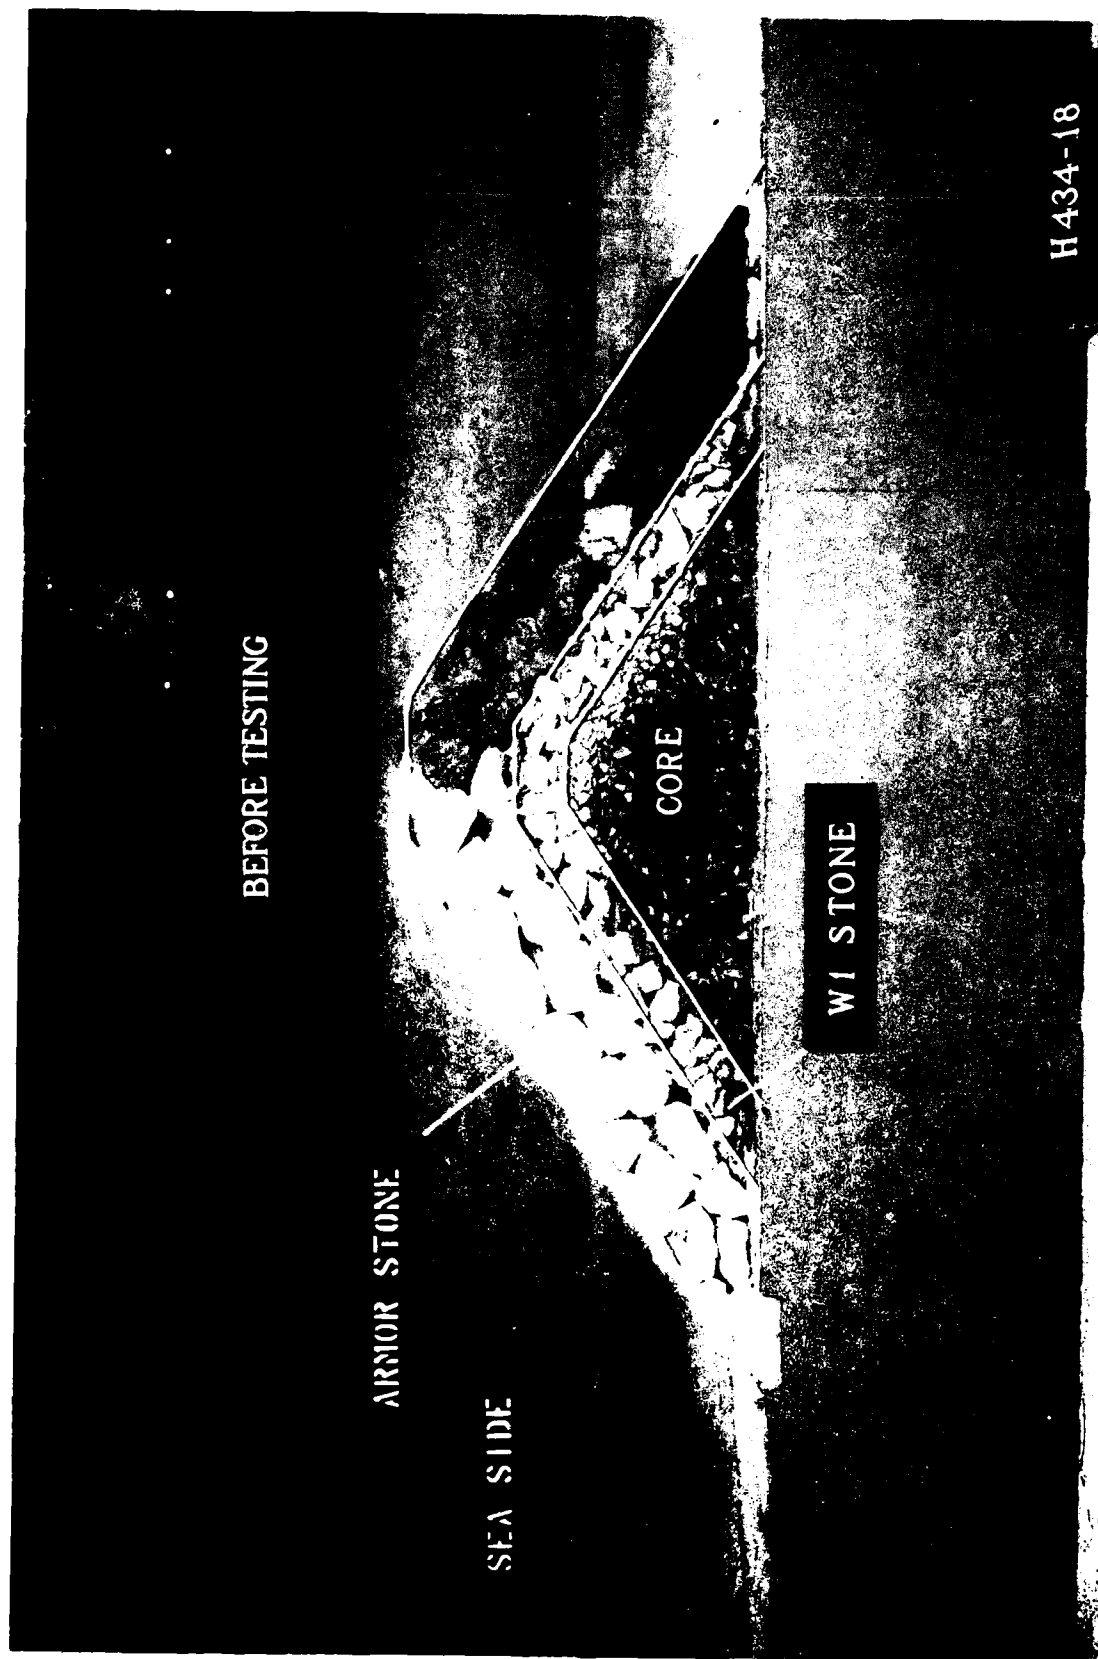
End view of a typical stone section before wave attack at a 1V-on-1.5H sea-side structure slope;  $W_a = 0.71 \text{ lb}$
